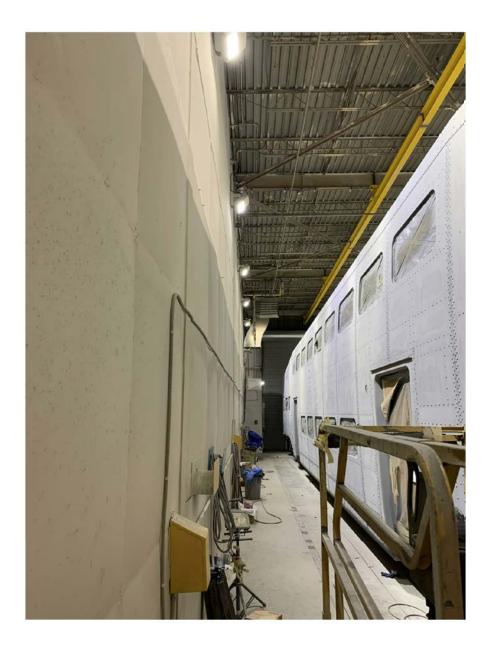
PHOTO D - EXISTING BLAST BAY INTERIOR WALL ALONG GRID 'D'.
